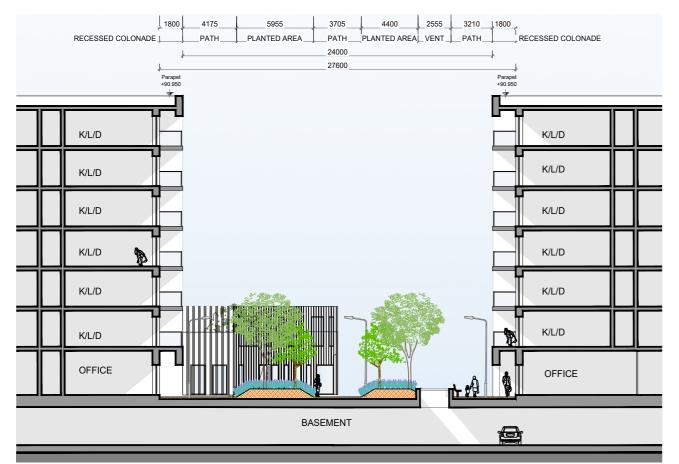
Section through Block 1 and 2 showing New Pedestrian Boulevard
